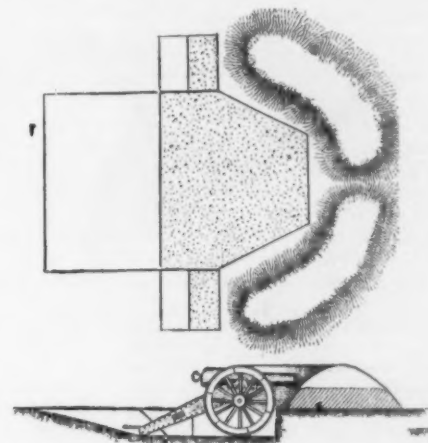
Hasty gun pit; protection in front and on the sides. Seven men, with full size picks and shovels, will construct this in one hour.
